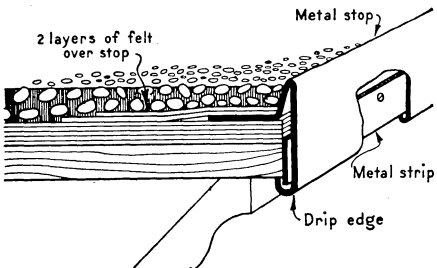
Gravel stop of 26-gage galvanized metal on edge of sheathing. Stop is 1 1/4 to 2 1/2 inches high on face.
